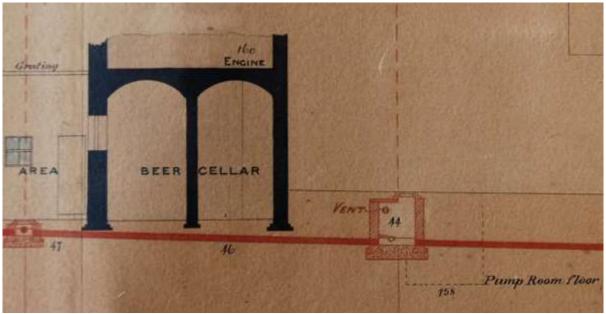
1886 Architects Plan – Section of Beer Cellar / Pump Room.
